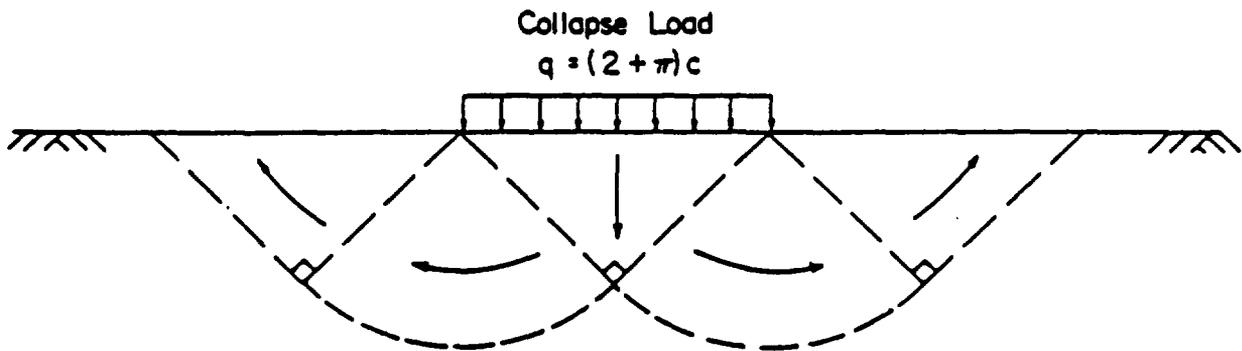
Failure Zones at Collapse Loading for Prandtl Wedge Solution
